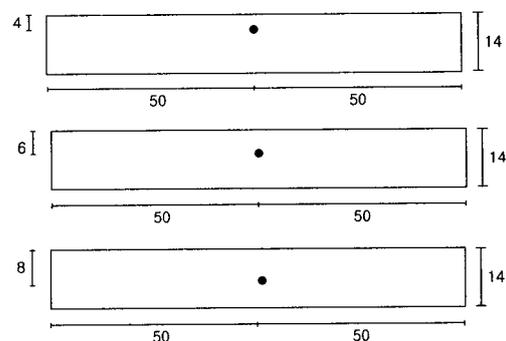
Cross-sections of mortar specimens with a steel bar (unit: cm)
